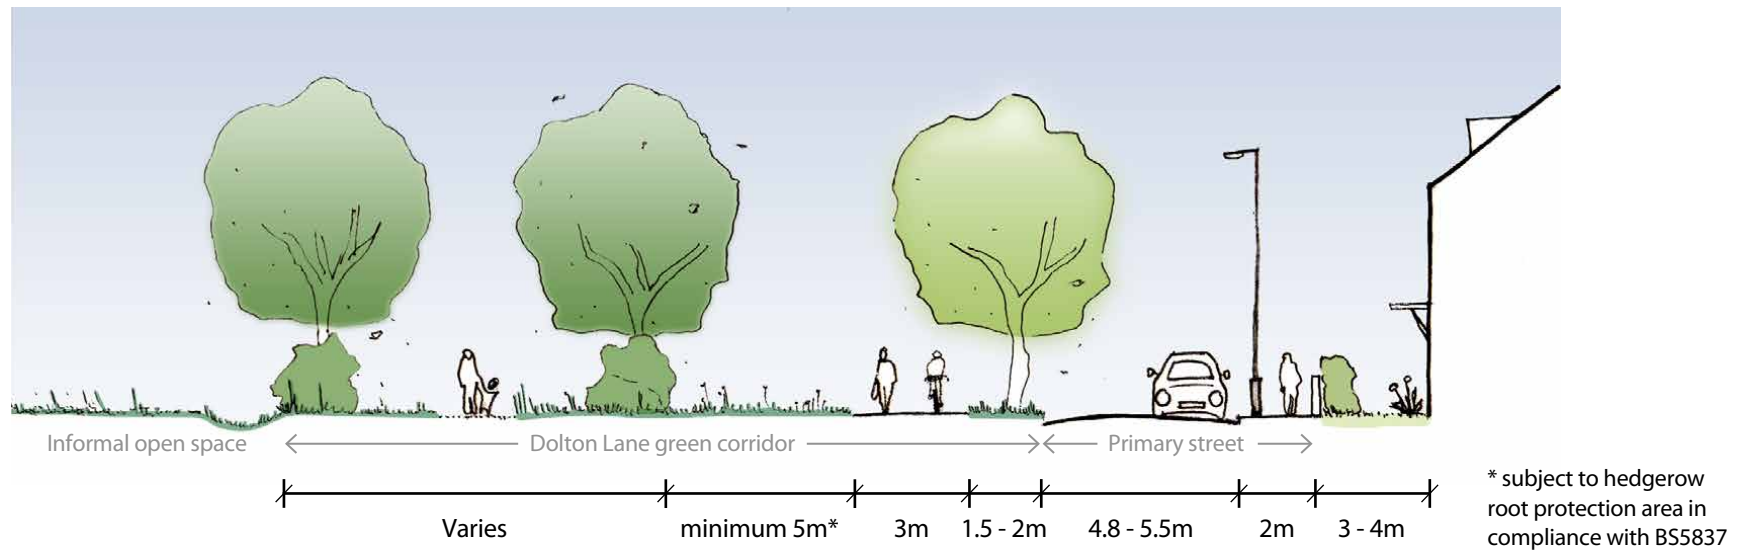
A-A – typical primary street cross section showing relationship to Dolton Lane (refer to Fig. 15 for section location)
